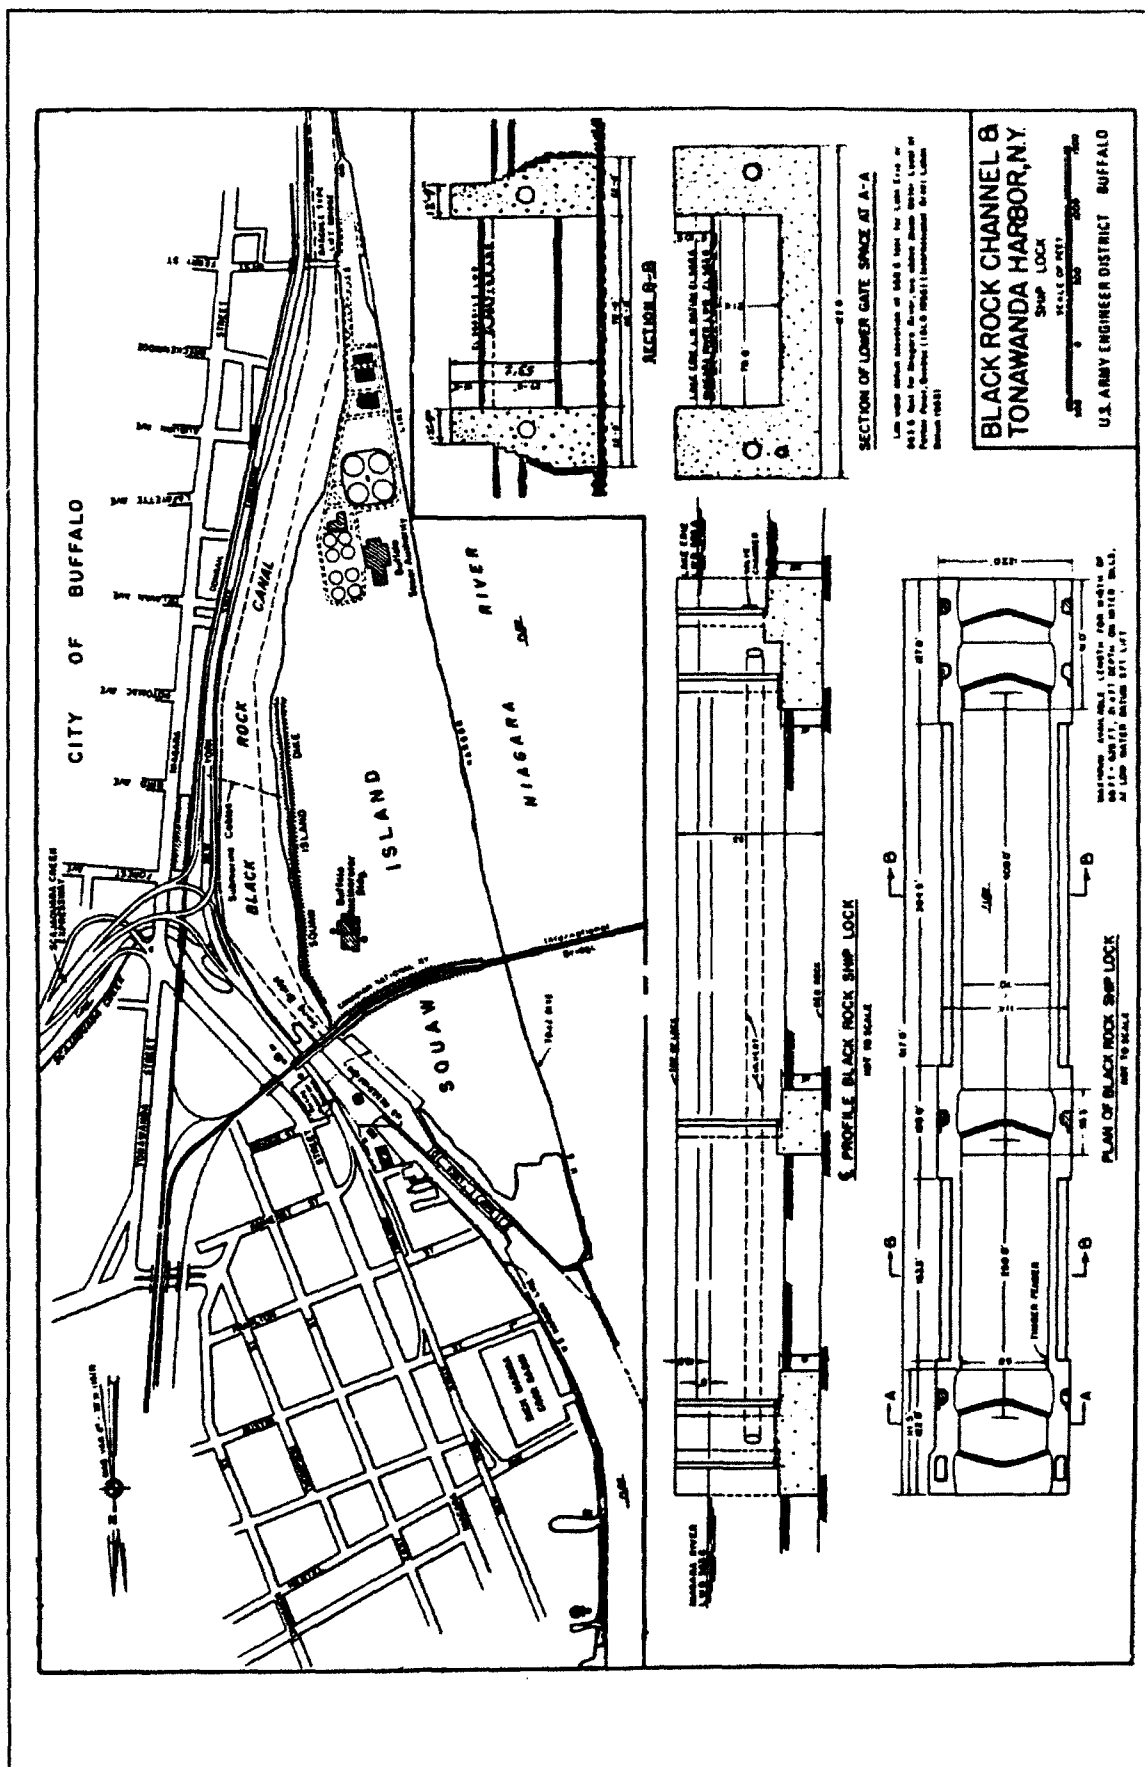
Location, plan, profile, and sections of the Black Rock Lock
